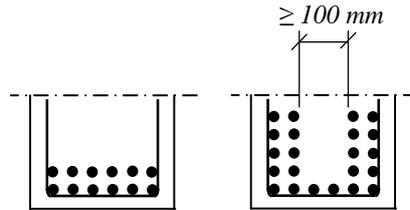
Arrangement of reinforcement with respect to satisfactory placing and compaction of concrete according to *Betonghandboken, Svensk Byggtjänst (1990)*.
